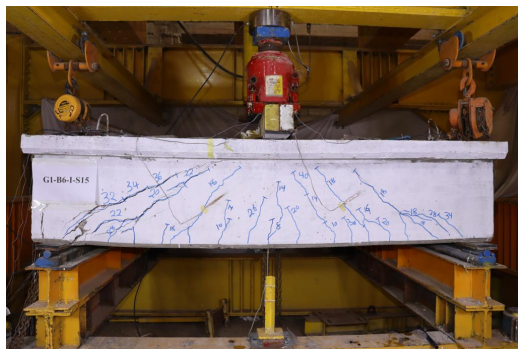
Failure crack pattern of specimen G1-B6-I-S15.
